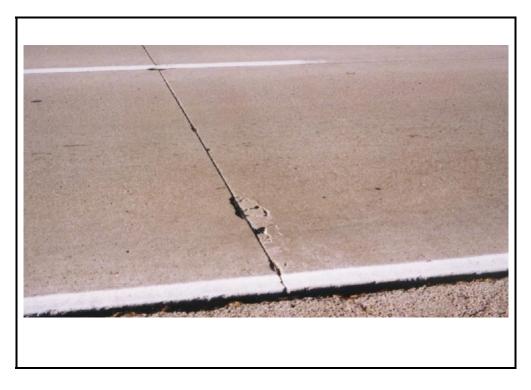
Transverse Joint Spalling in Jointed Concrete Pavement, Low Severity
